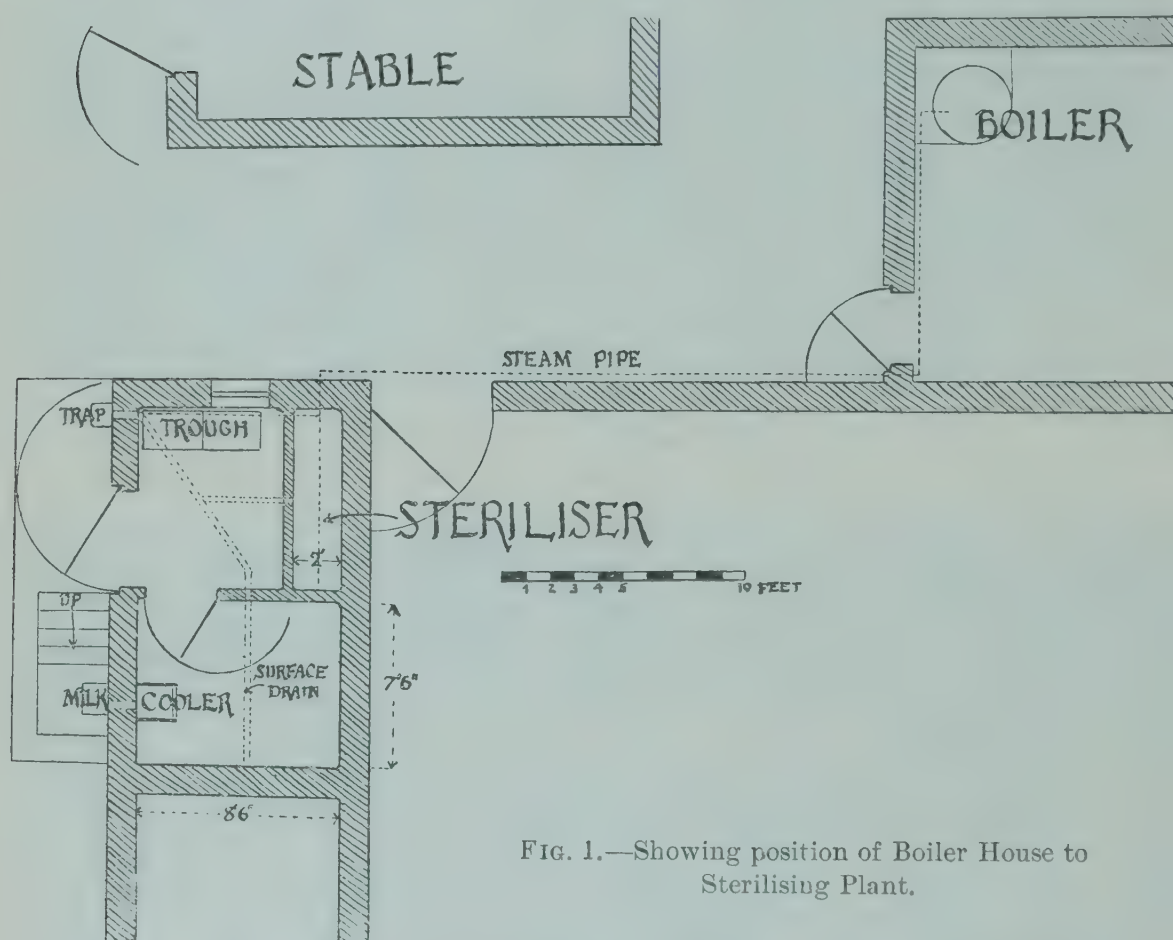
Showing position of Boiler House to Sterilising Plant.
